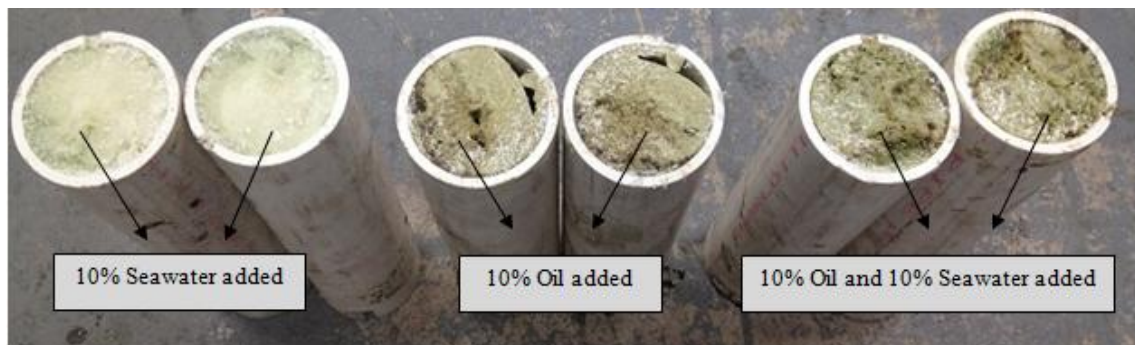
Cross section of 3 inch grouted pipes with Grout-5 and different contaminations
